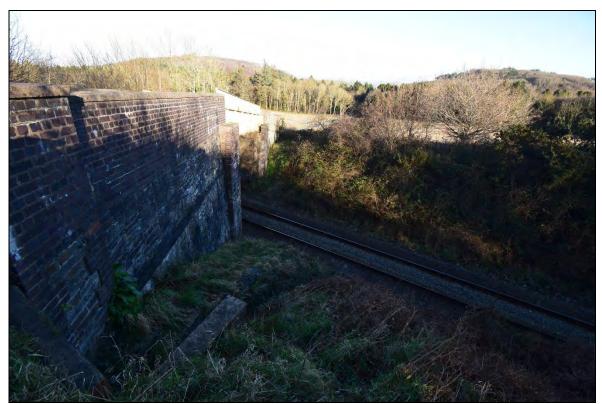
IBR2024_034: A view of the line of the proposed Active Travel Route where it would cross the Cambrian Railway via a new bridge. Looking northeast.
